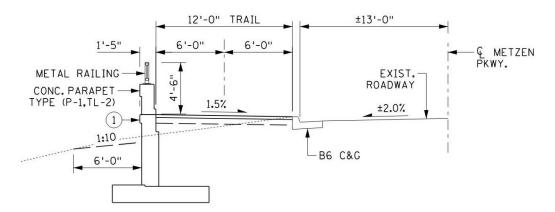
Recommended Approach Alternative 2 with Trail at Back of Curb & Gutter
